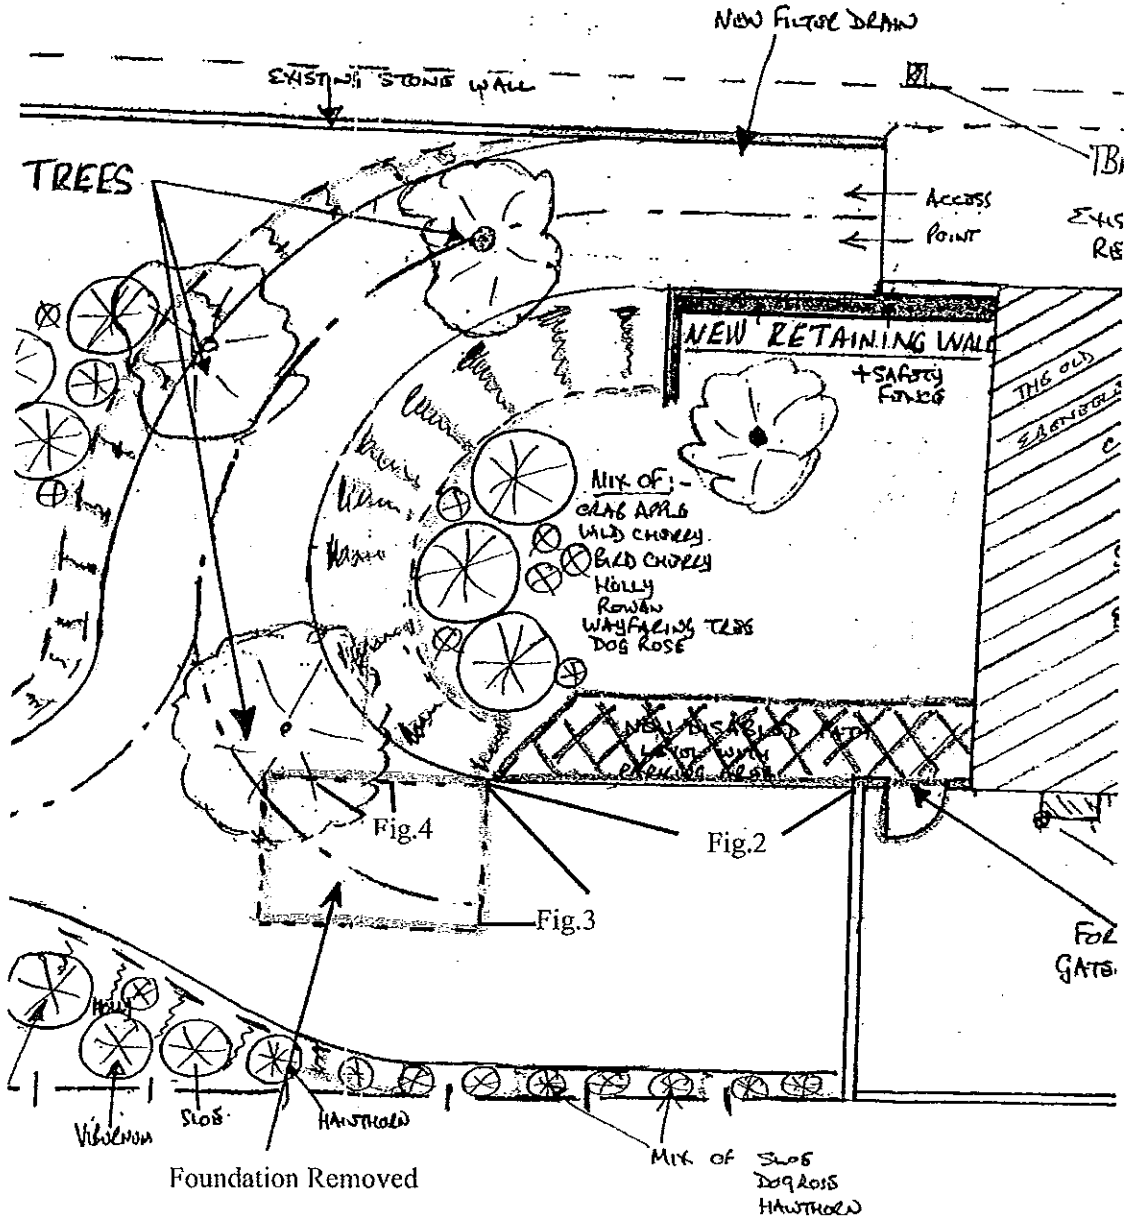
Plan to show walls drawn. Based upon drawing supplied by East Yorkshire Farm Services. Scale 1:100 @ A4
